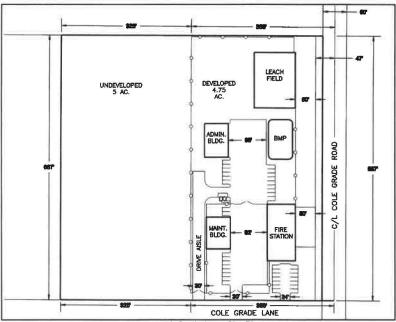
Preliminary Site Plan (source: Buccola 2020)
